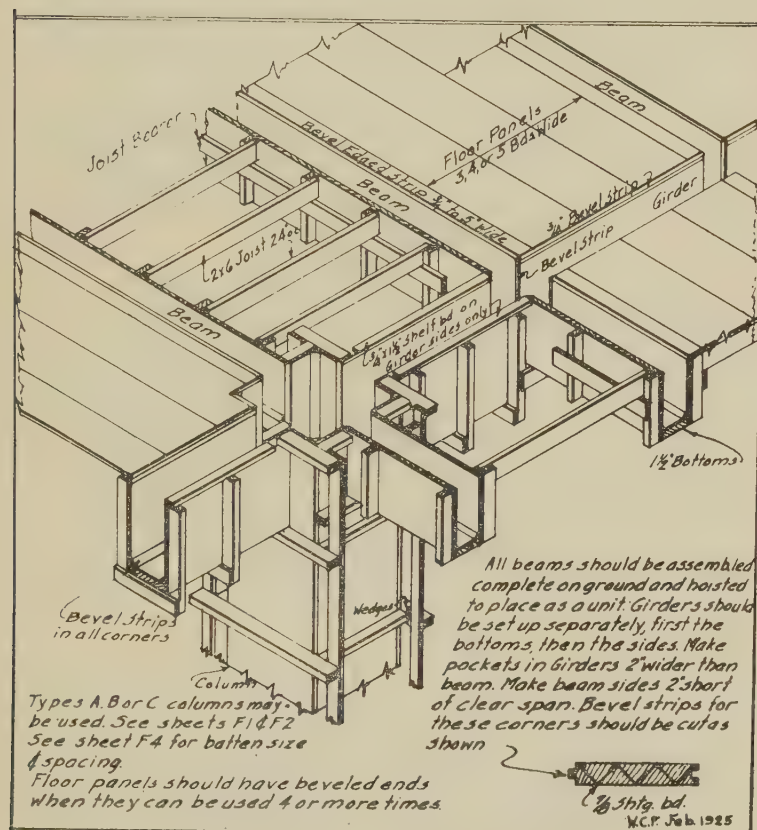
BEAM AND GIRDER FORM DETAILS.
